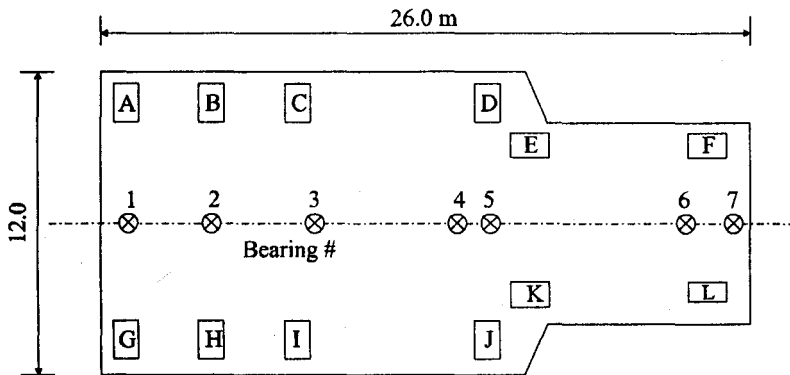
A 210 MW T G Foundation (Typical) - Top Deck Plan Showing Column and Bearing Locations
